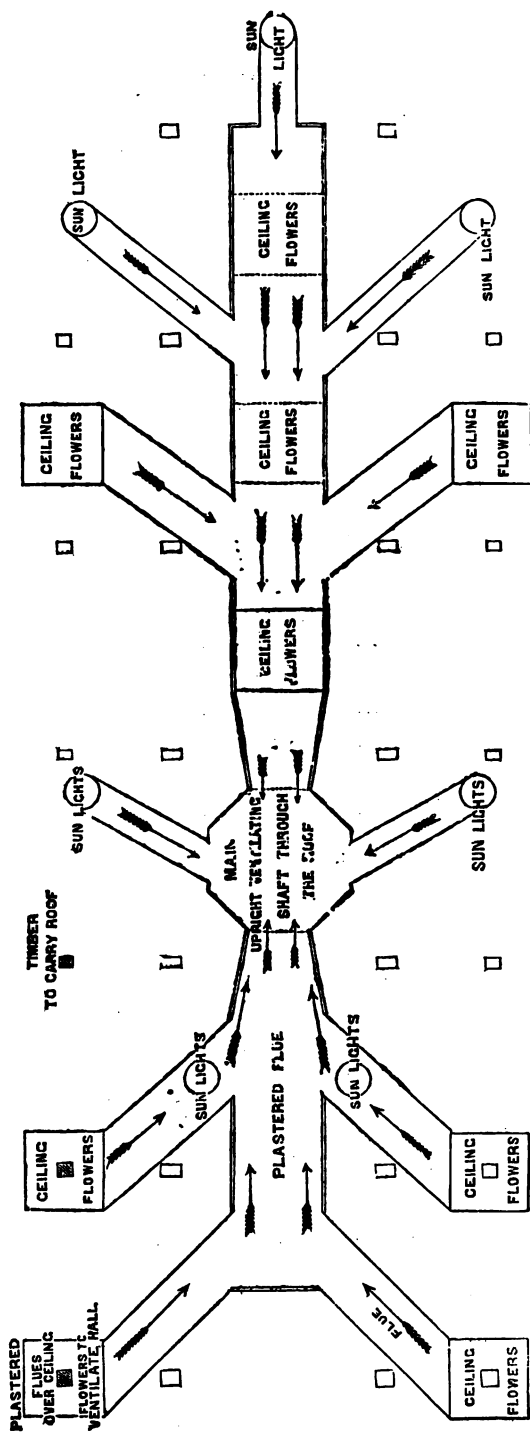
Fig. II.—PLAN OF FLUES AT CONCERT HALL, MANCHESTER.
